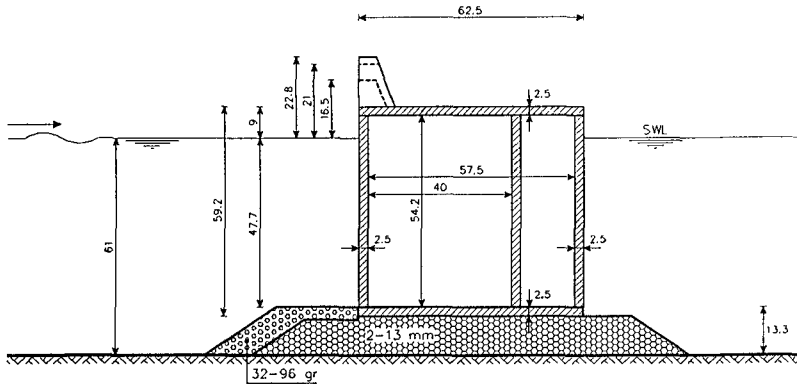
Cross-section of the caisson with the simple plain vertical wall
